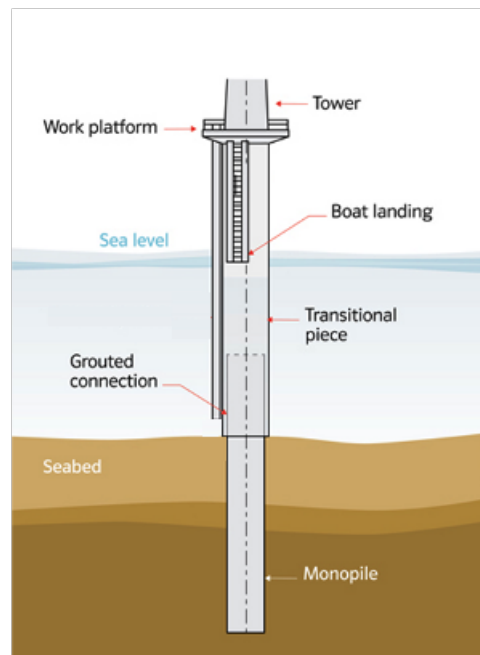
Structure of a monopile foundation used for offshore wind applications (Source: Garrad Hassan and Partners Ltd.)
